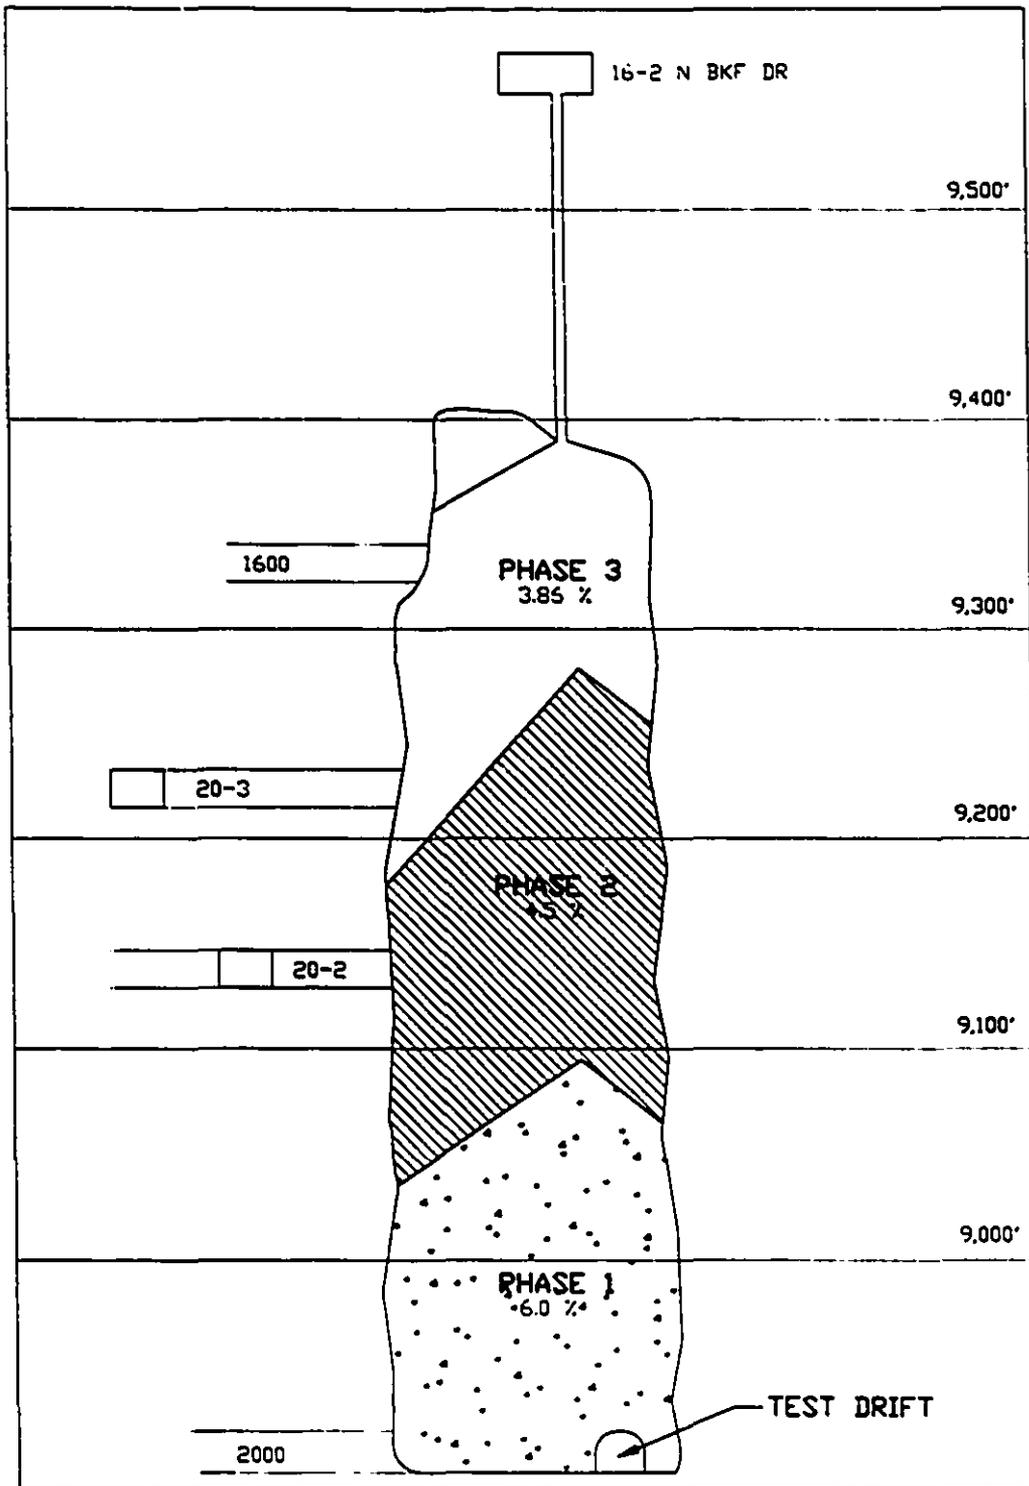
2021-M-ST LOOKING NORTH
